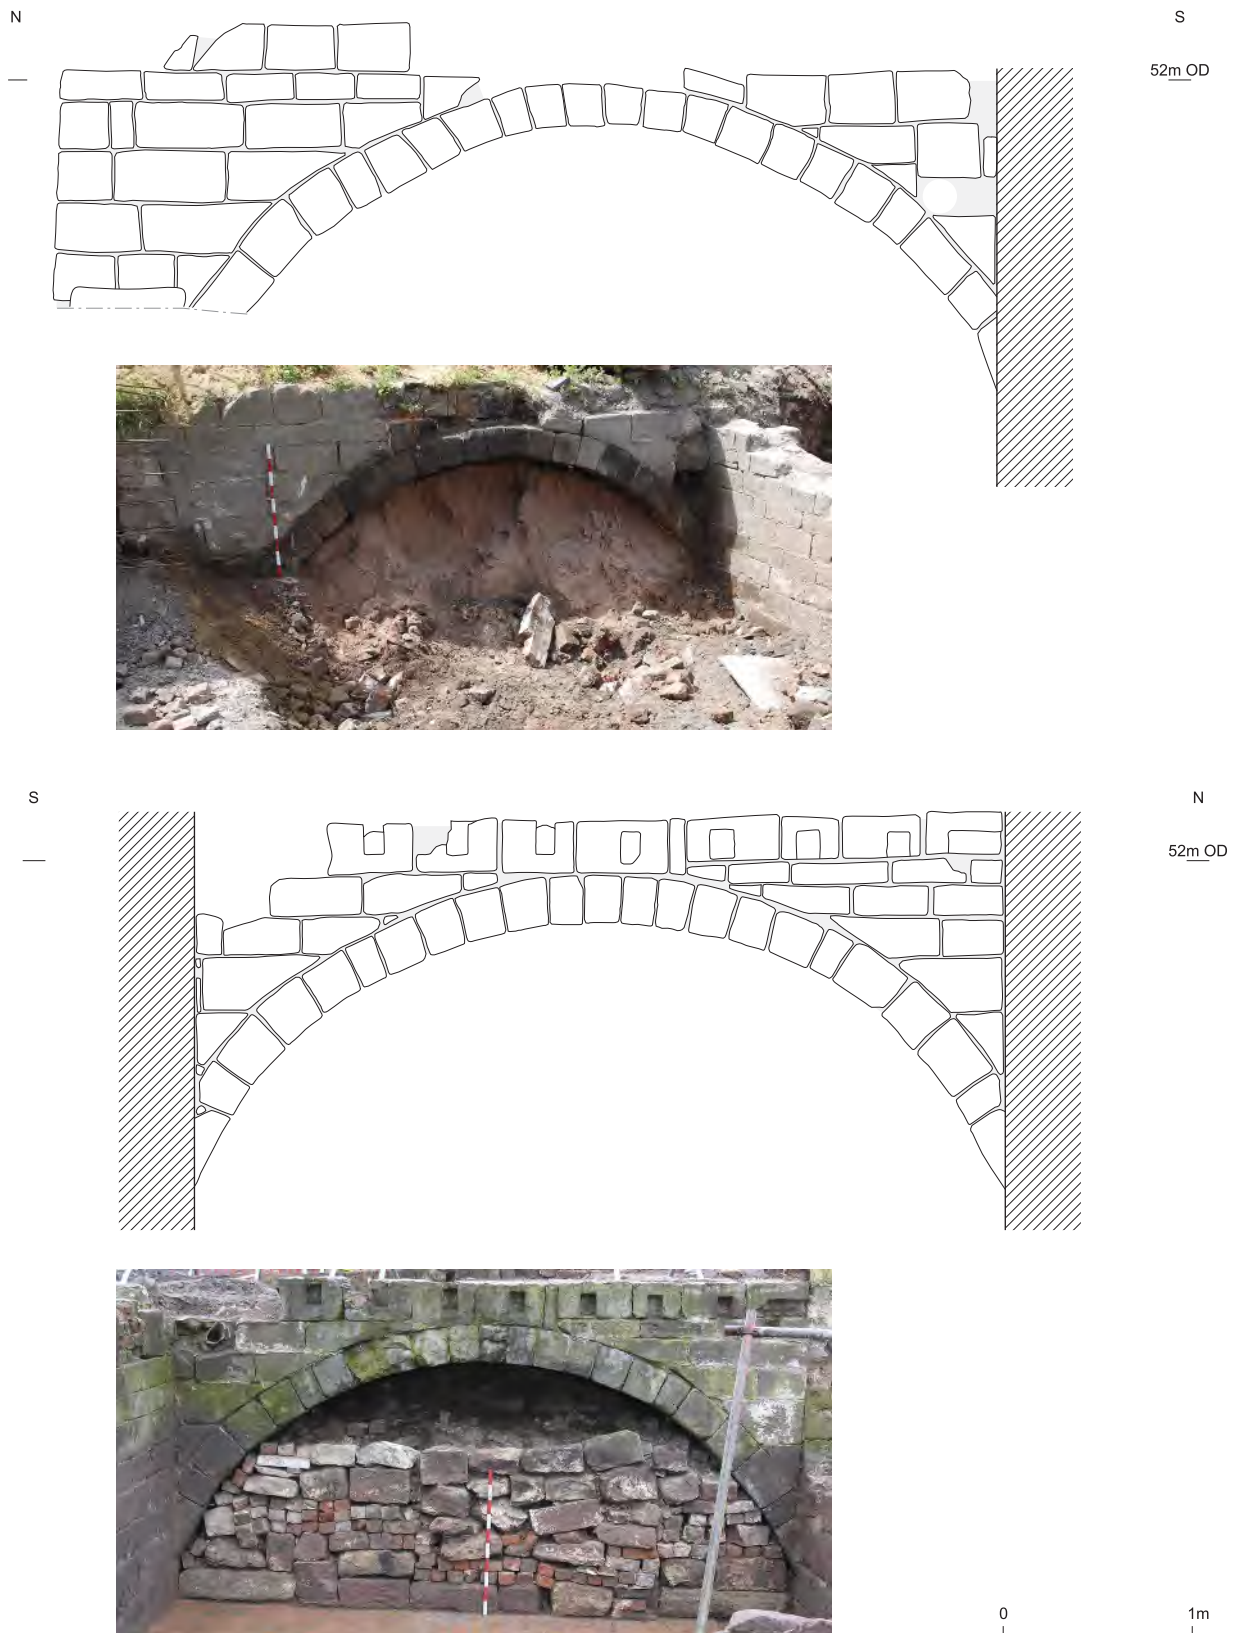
Drawn elevations of the east (upper) and west (lower) faces of the dry arch (B9) and adjoining masonry (scale, elevations 1:40; photos 1.0m scales)
